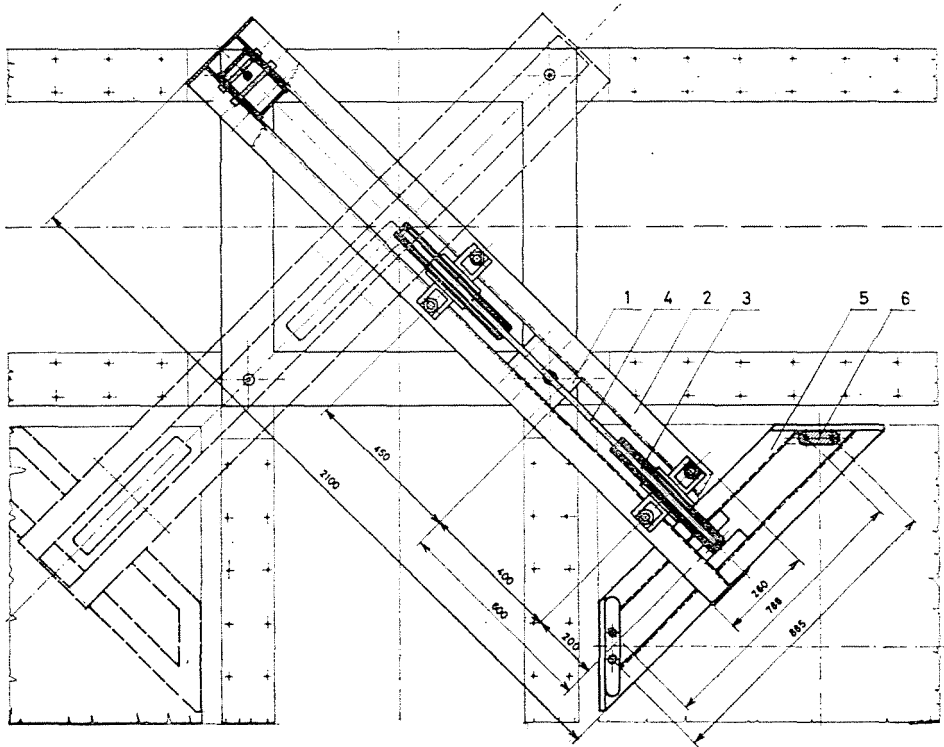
Lifting equipment integrated with the structure: lifting cantilever jointable in four positions to columns of the uppermost pillar skeleton-frame and lifting bridge fixed to the lifting points of cellular floor-fields. Plan. 1. leg; 2. lifting cantilever; 3. rope-wheel; 4. lifting rope; 5. lifting bridge; 6. pressing bolts
